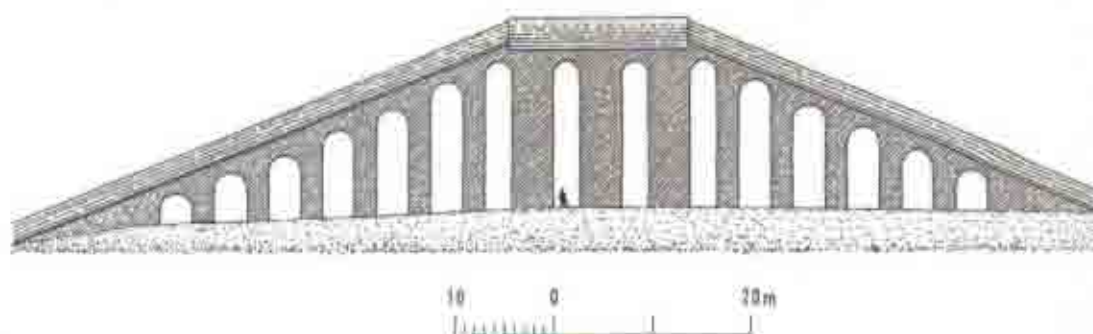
Hydraulic tower at Craponne (reconstruction, Haberey 1972, 156).
